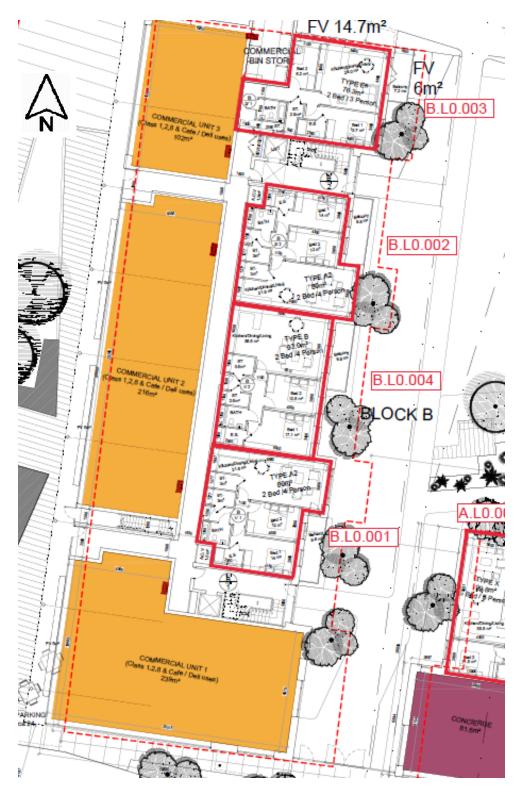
Floor Layout of the Proposed Scheme Block B – Ground Floor
